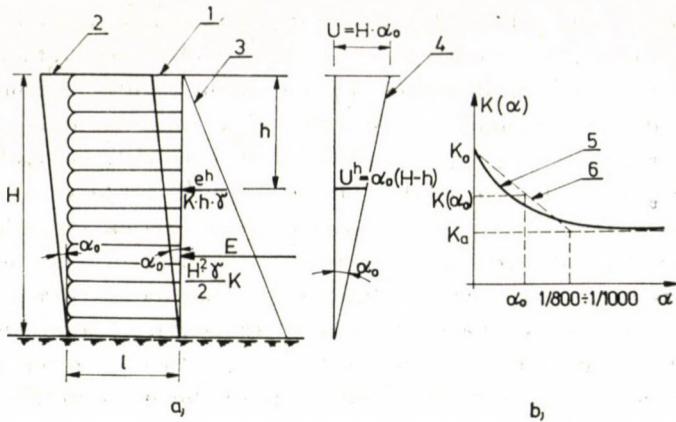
Estimation of the deformation in the reinforced earth retaining wall. a — Sketch of the wall displacement; 1 — the reinforced earth retaining wall; 2 — deformation line; 3 — backfill pressure; 4 — displacement originated from the wall-tilting; b — calculation of the earth pressure, 5 — exact curve for $K = K(\alpha)$ function; 6 — approximate straight line
